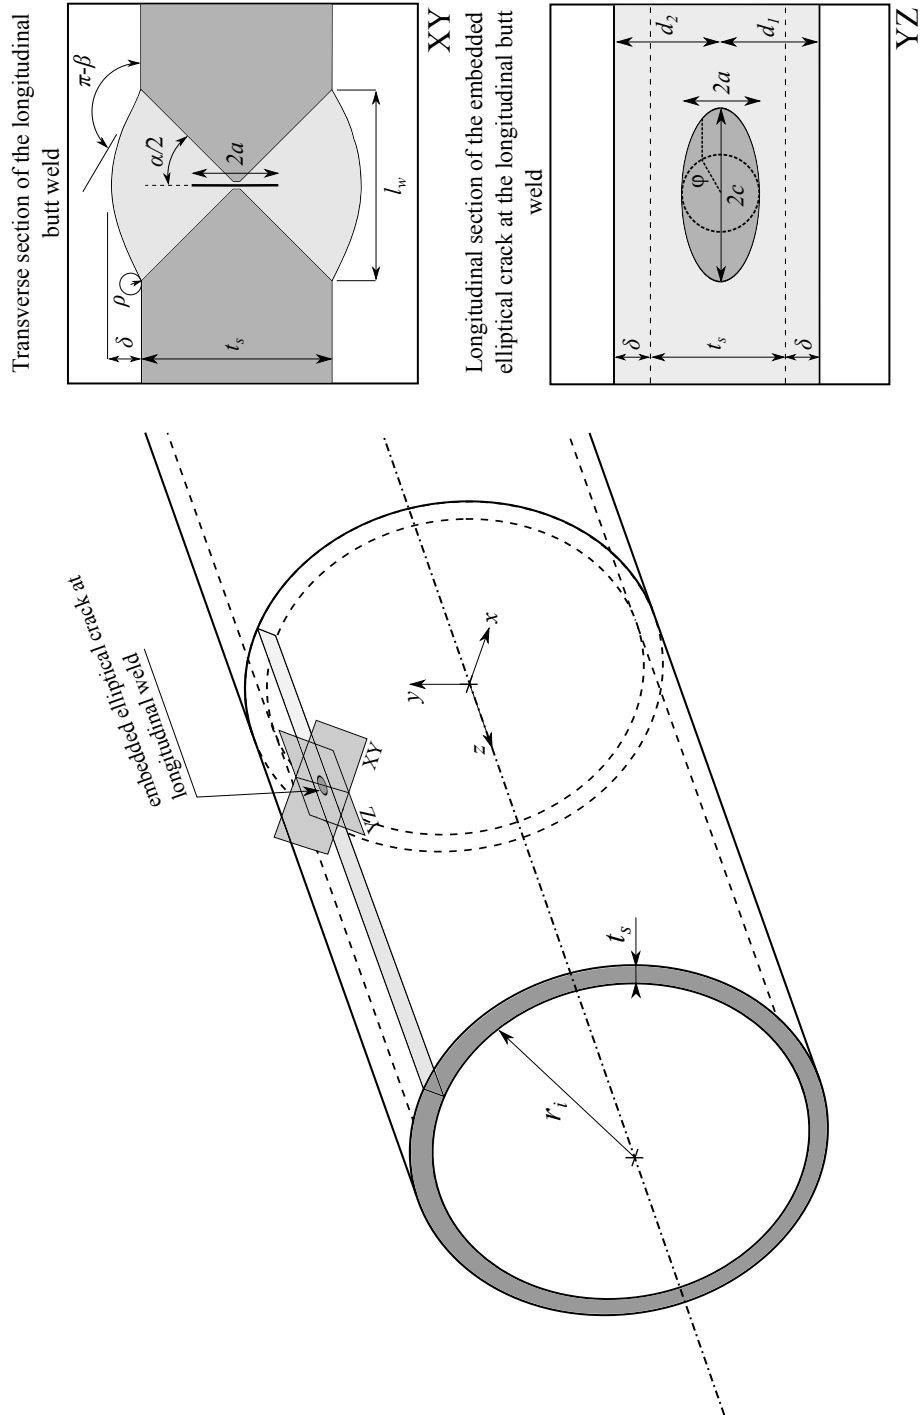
Definition sketch of a steel liner with an axial embedded elliptical crack at the longitudinal butt welded joint.
